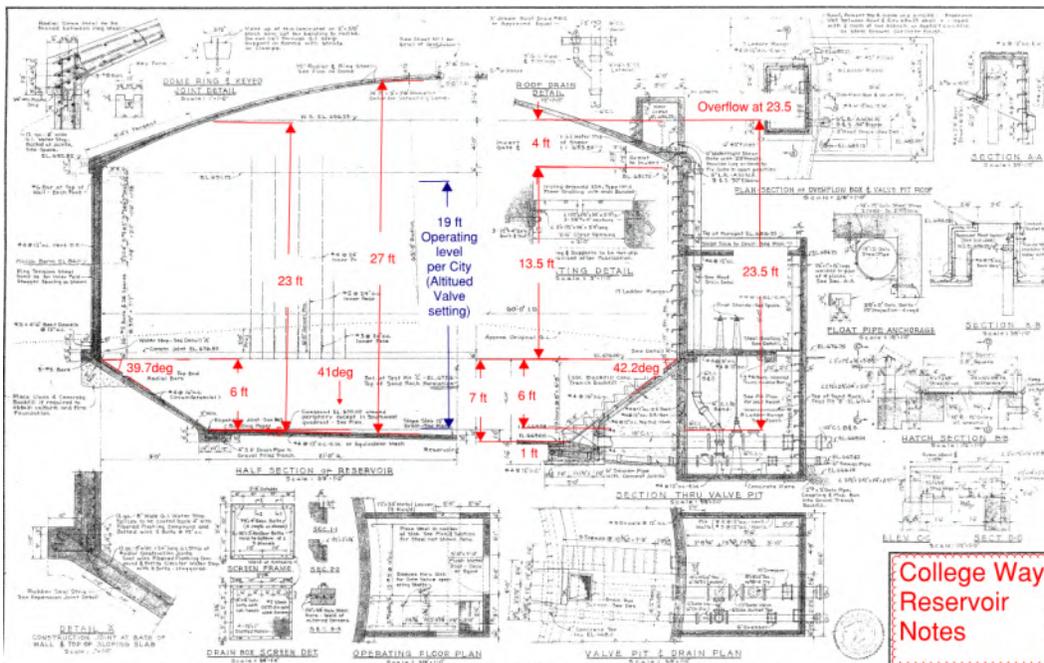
College Way Reservoir Sections and Details (Drawings are based on 40th St)
